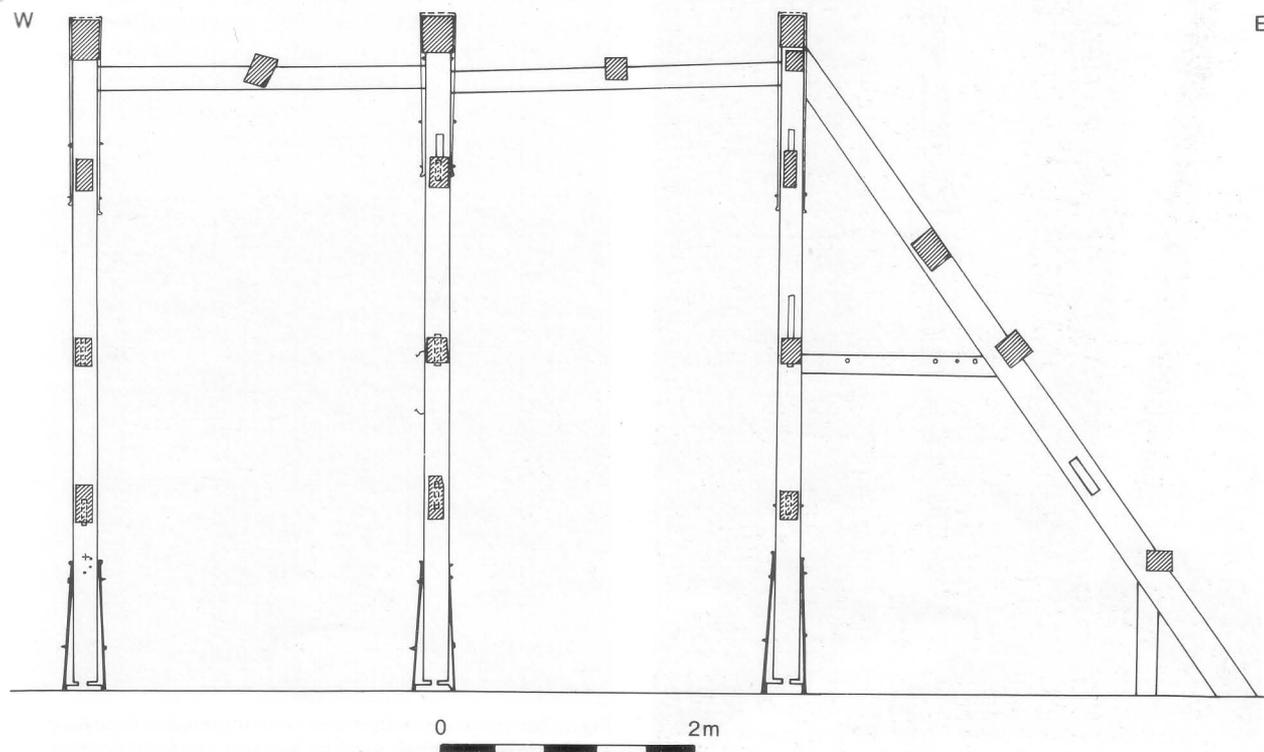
south-facing elevation of arcade or aisle posts on north side of roof (S. Hurman).
